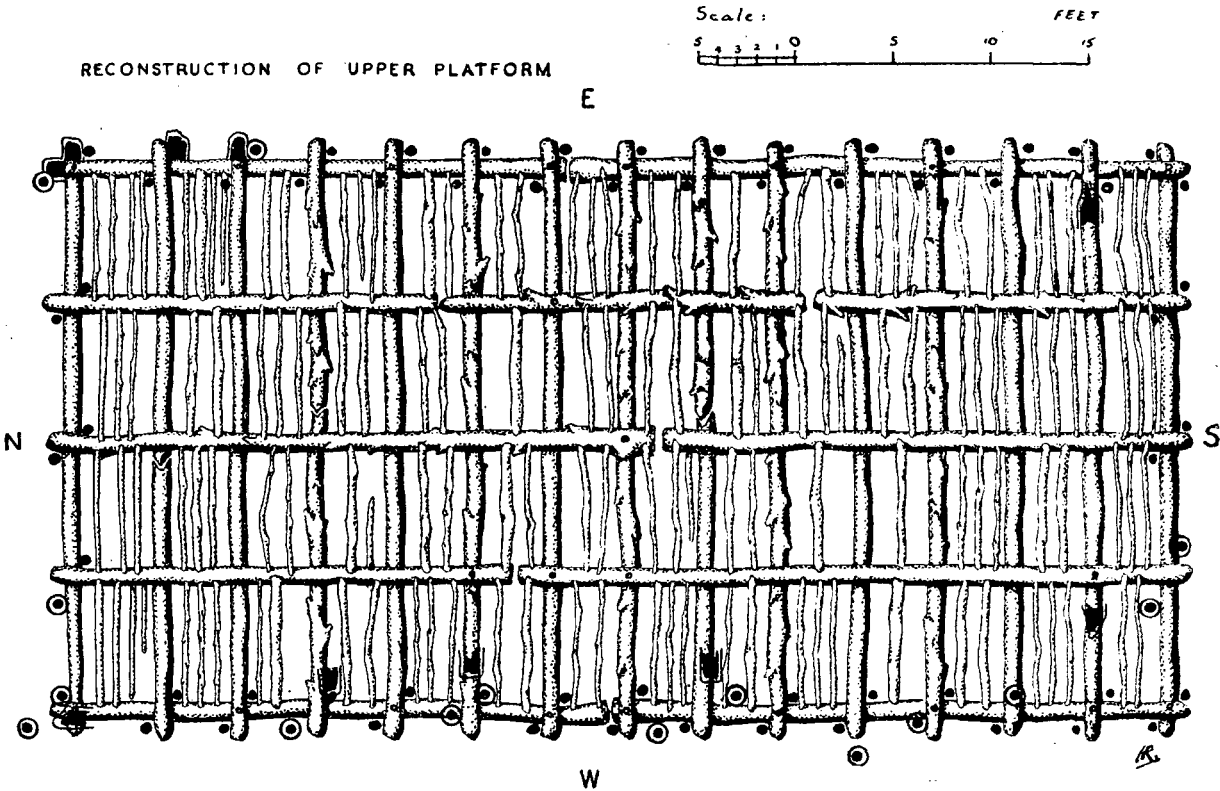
Reconstruction of upper platform. Black dots indicate supposed positions of upright posts. Black ends of beams and dots, surrounded by a line, show actual positions of beams and posts visible before excavations began.
